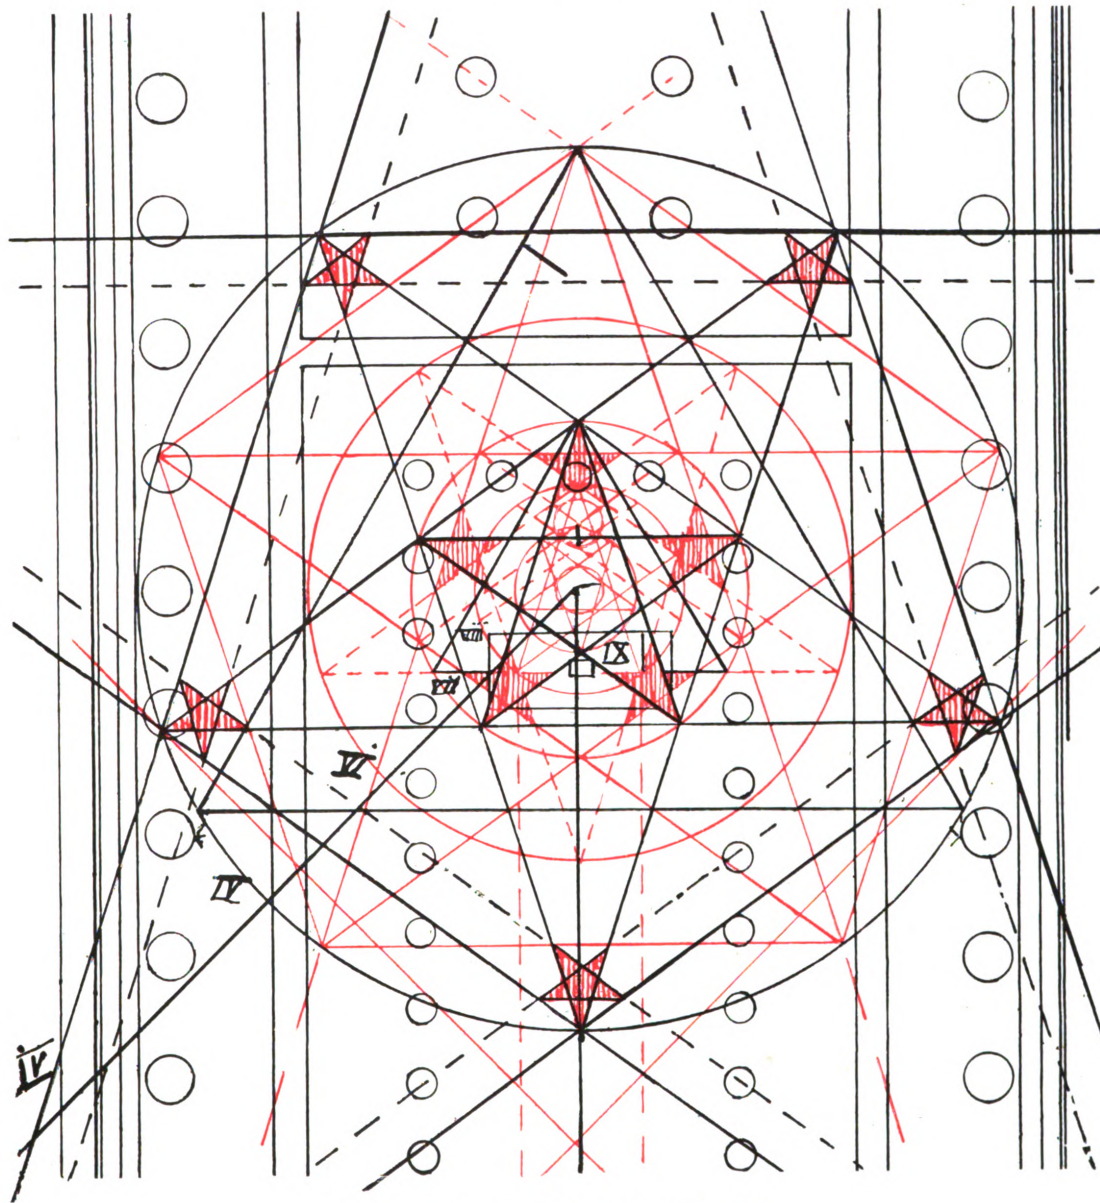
Parthenon. Section of plan on Plate XVI.
